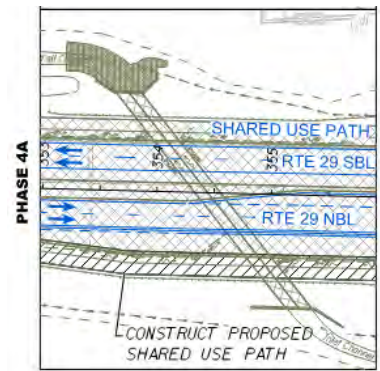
Willow Spring Branch Culvert Construction Sequence (Cont'd.)
